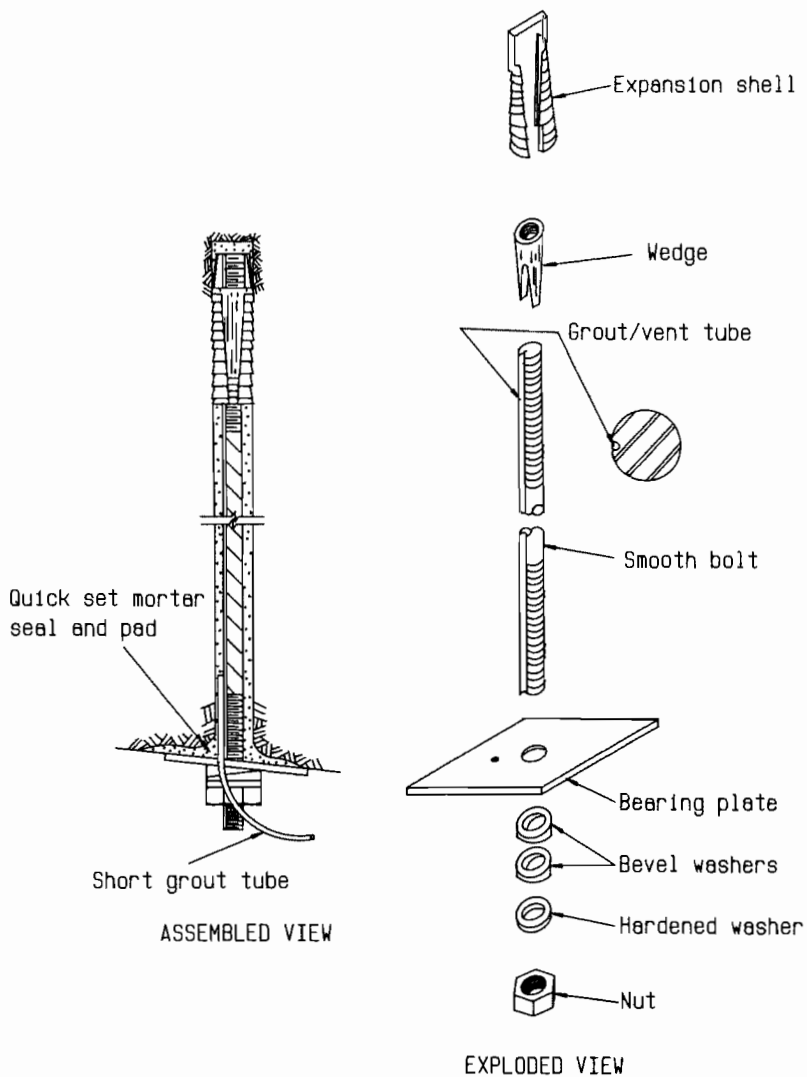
Groutable Smooth Bar Rock Bolt With Integral Grout Tube (U.S. Army, 1980).
